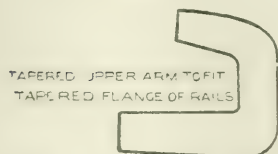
ENLARGED DETAIL OF CRAMP.
